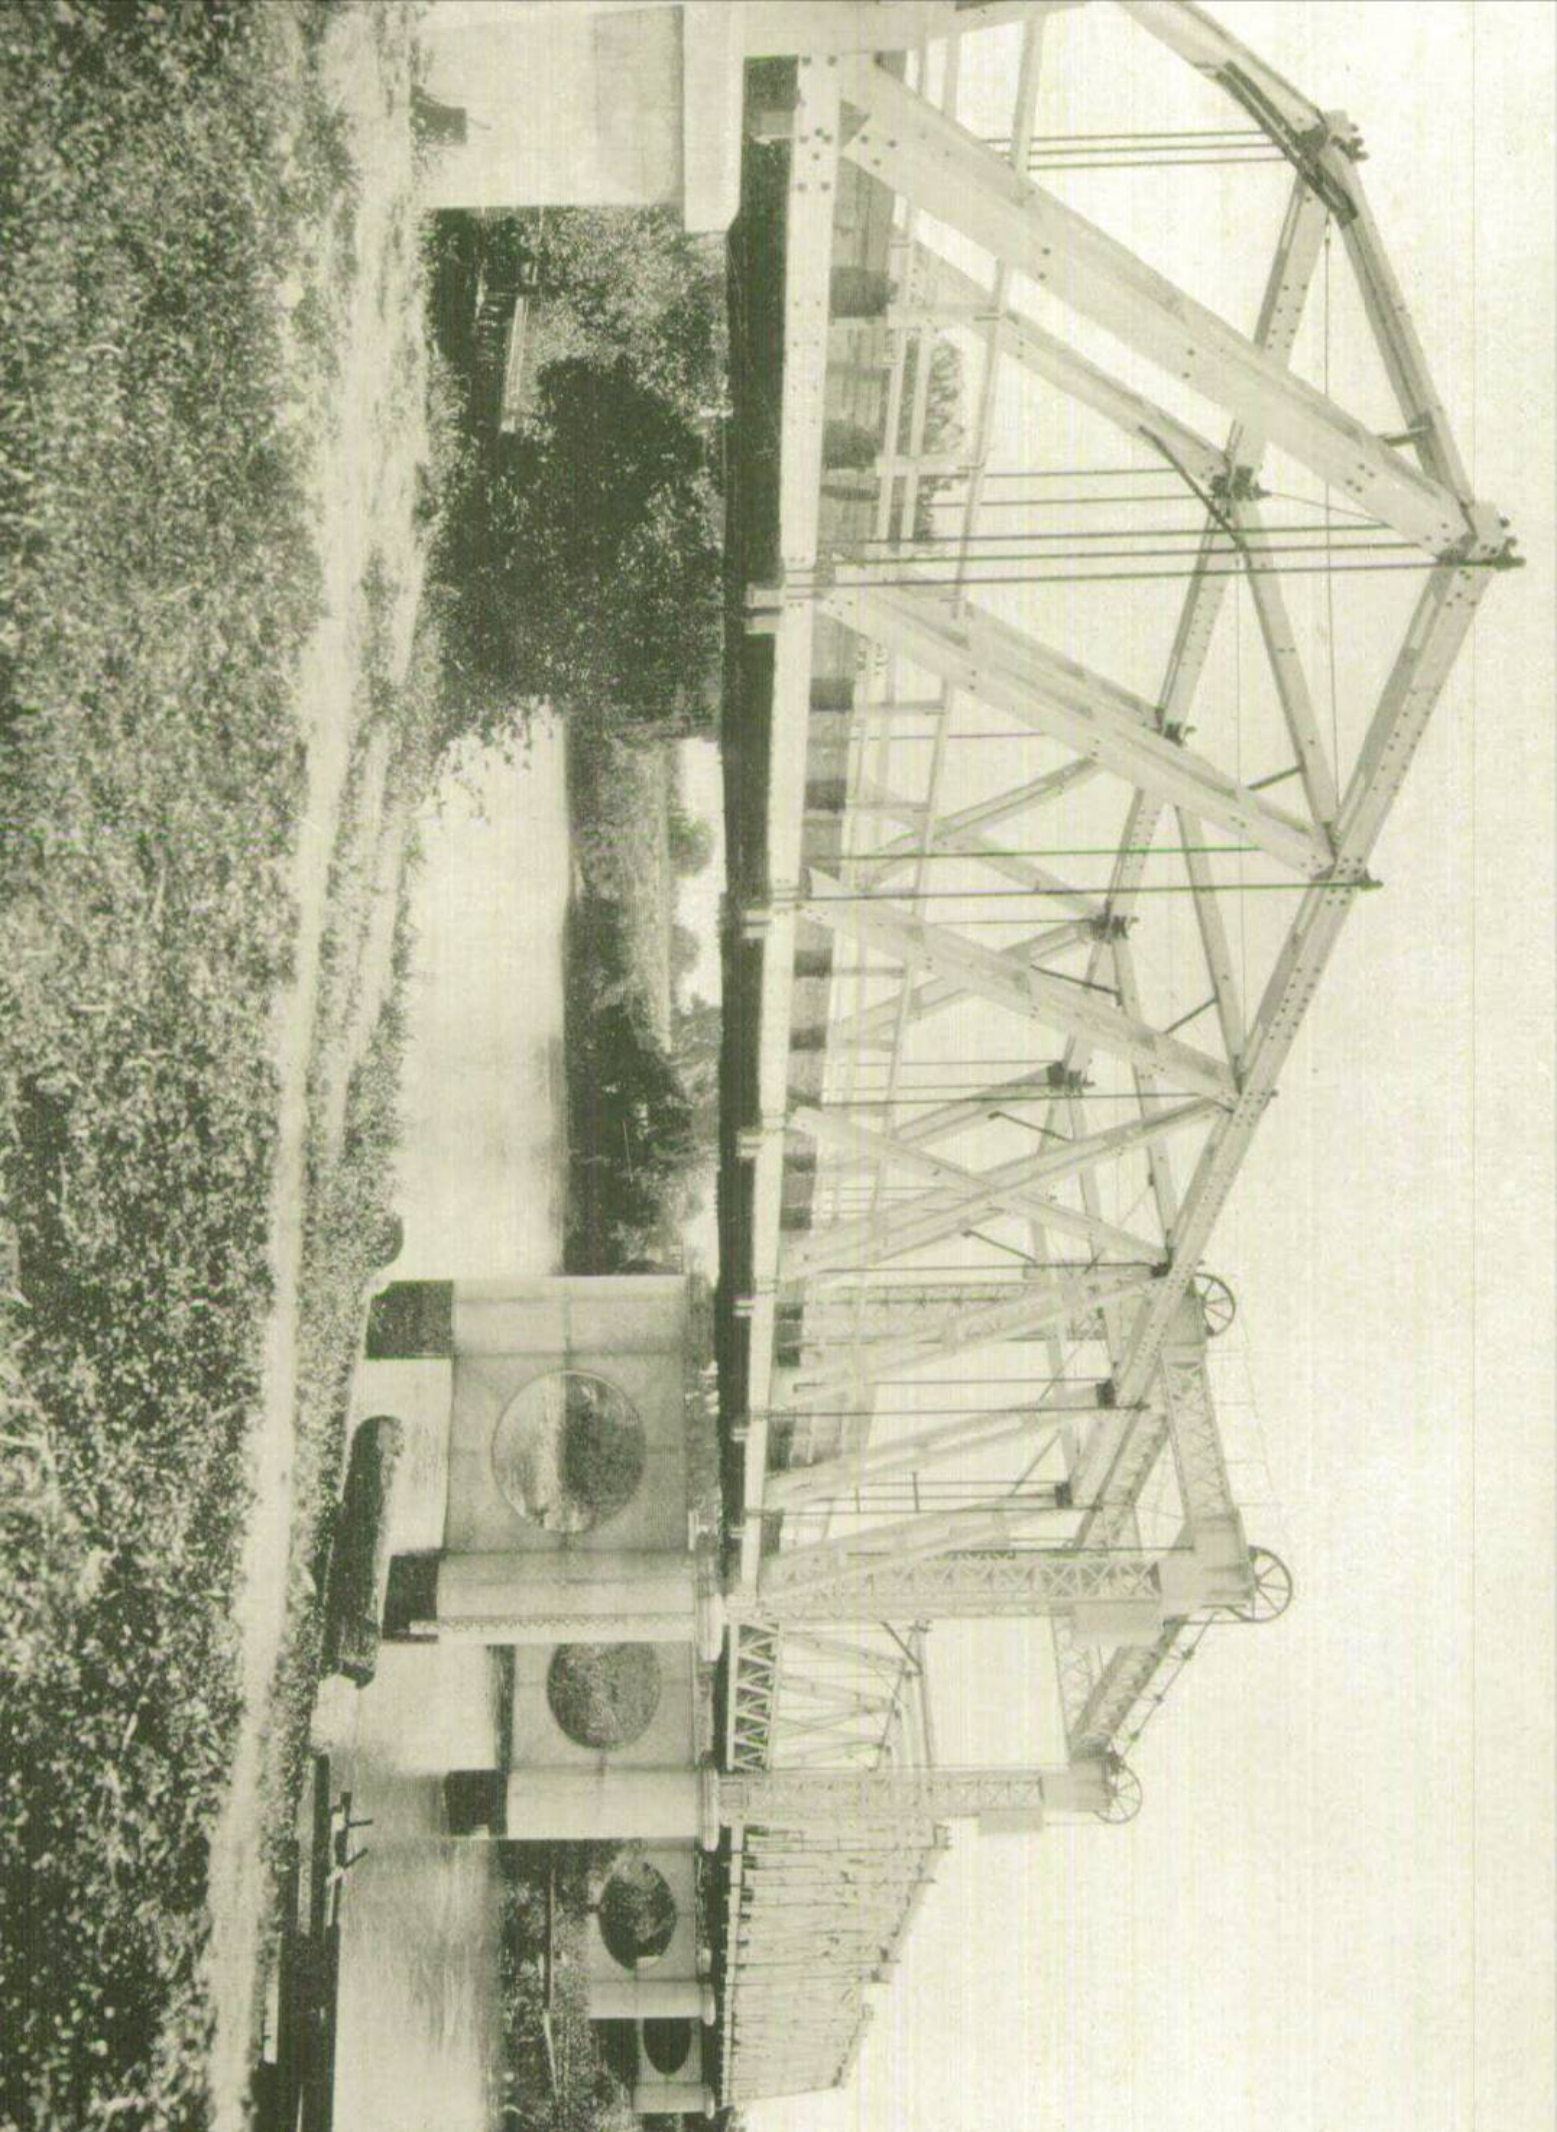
Allan Truss: Vacy Bridge over the Patterson River near Dungog
